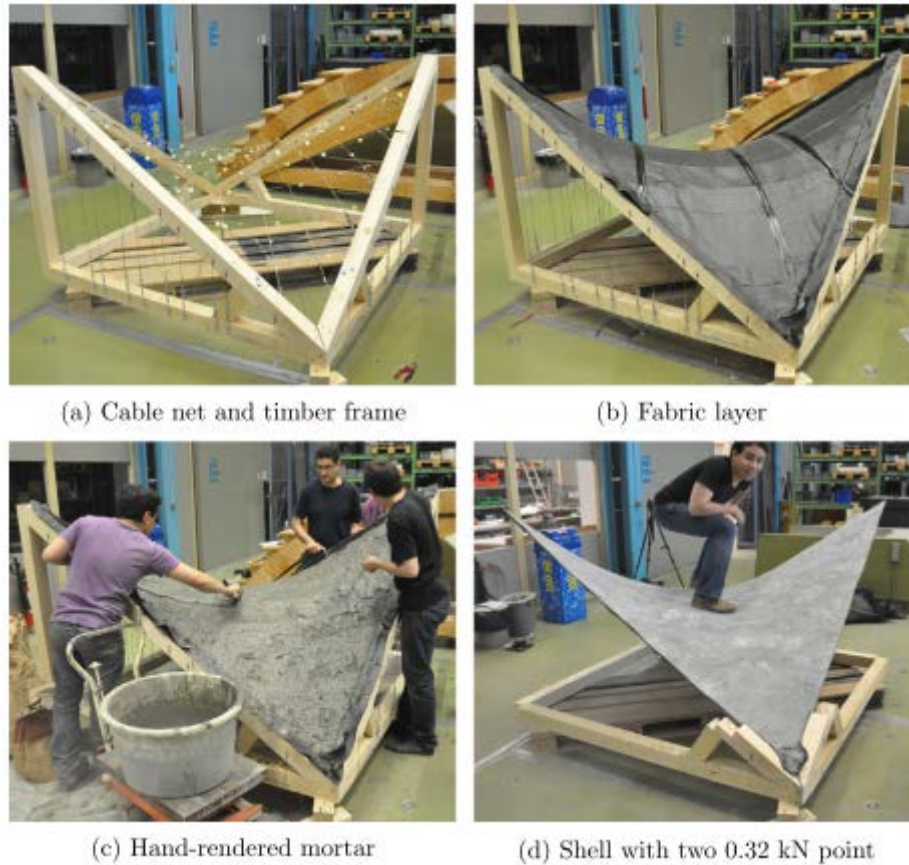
Shell construction by reducing the tensile forces (Veenendaal and Block 2014).
